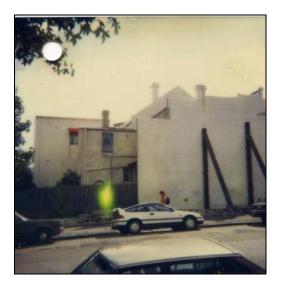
Photograph showing east elevation of 86 Darlington Road in 1992 before alterations and additions were undertaken to the rear. (Source: University of Sydney Archives: Buildings/alterations and additions/85 Darlington Road corner Codrington Street, Ref: 062/00240087).
